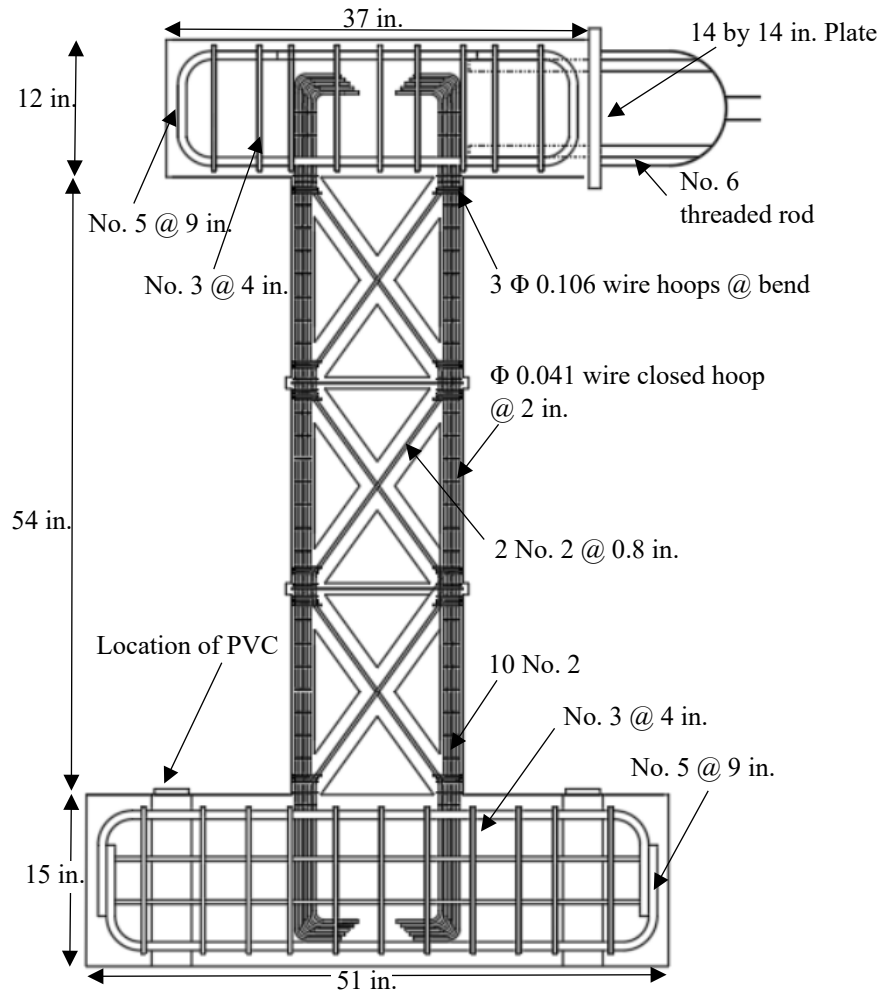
Reinforcement details of optimized wall specimen (top and base block reinforcement are the same as shown in Figure 3.1)
